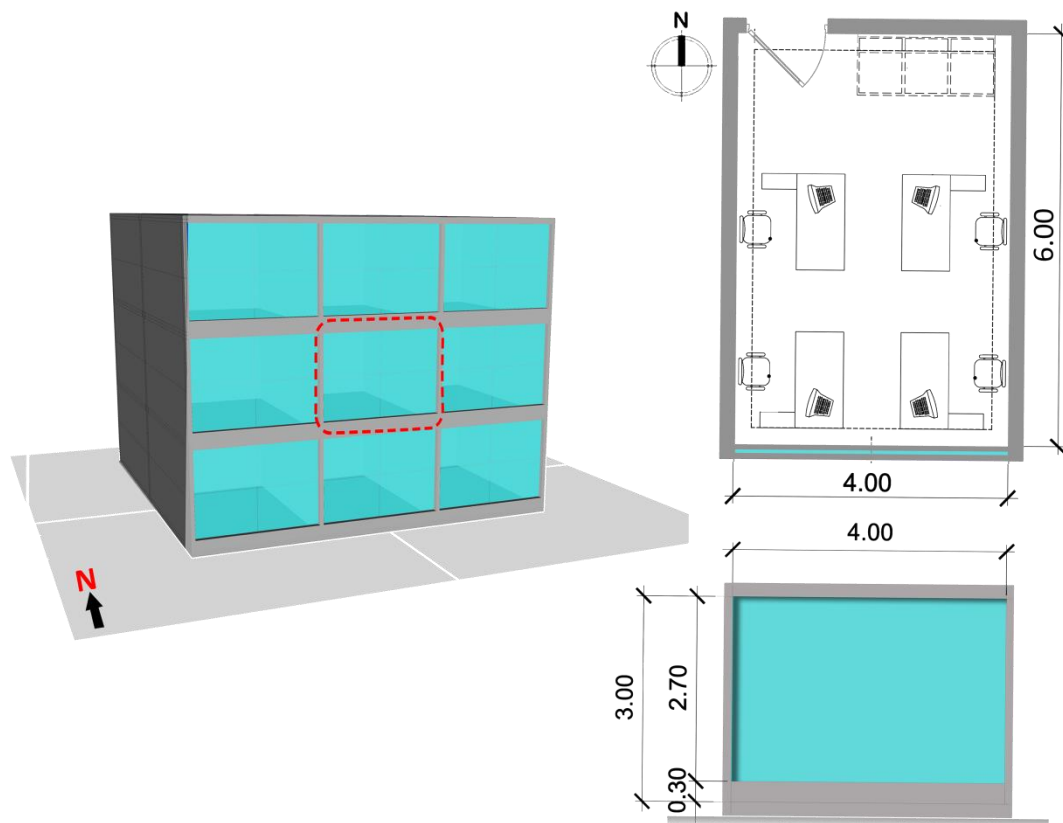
Base case 3D model showing its dimensions and location in the building.
